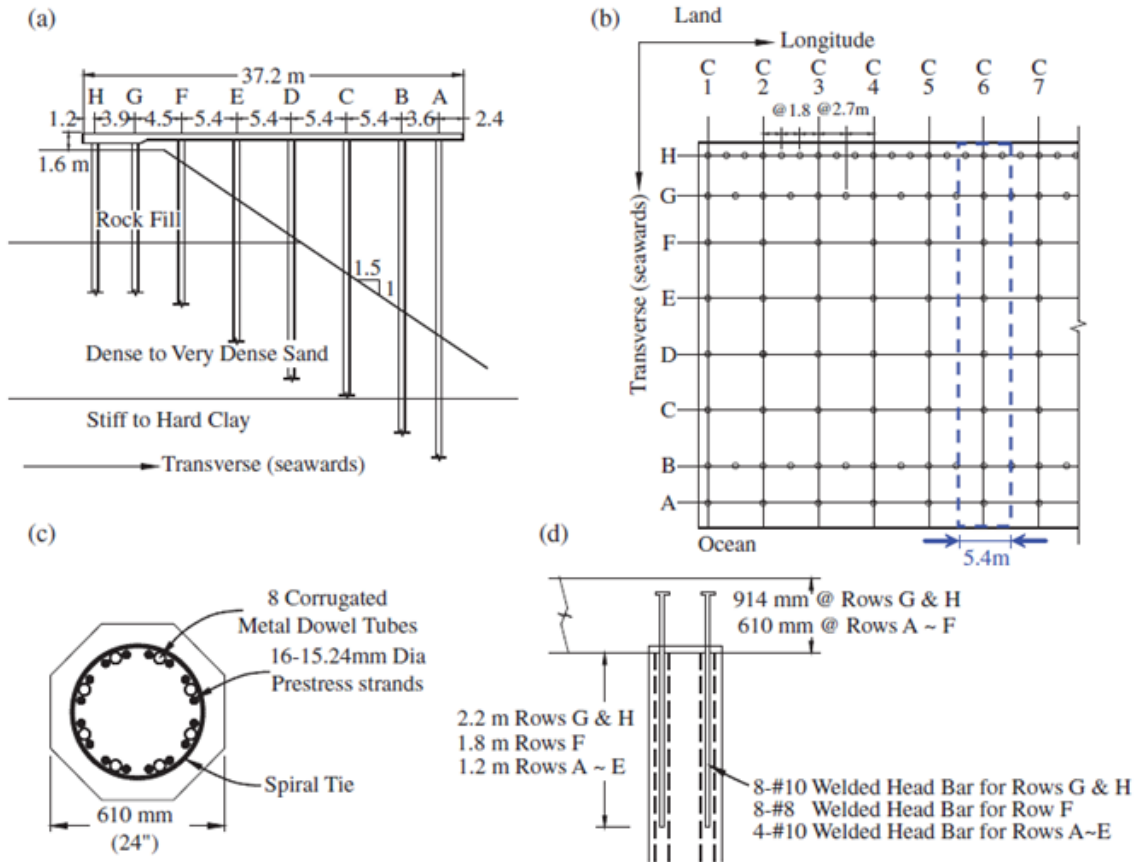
Vertical-pile-supported wharf: (a) schematic of wharf transverse section; (b) wharf pile plan; (c) prestressed pile details; and (d) pile-to-deck connections from Yang *et al.* (2012)
